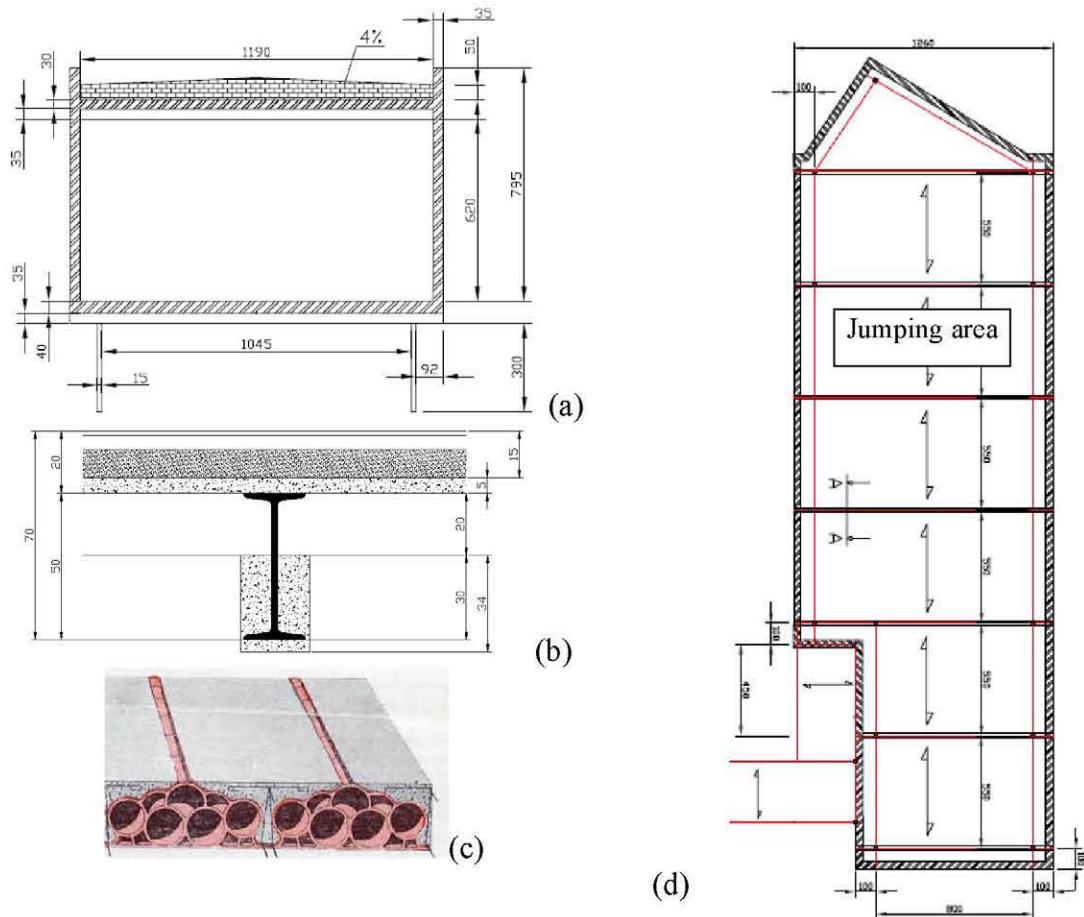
a) General cross-section b) Longitudinal cross-section showing the primary beam in a typical span. c) Typical transverse cross-section of the floor. d) Floor plan.
